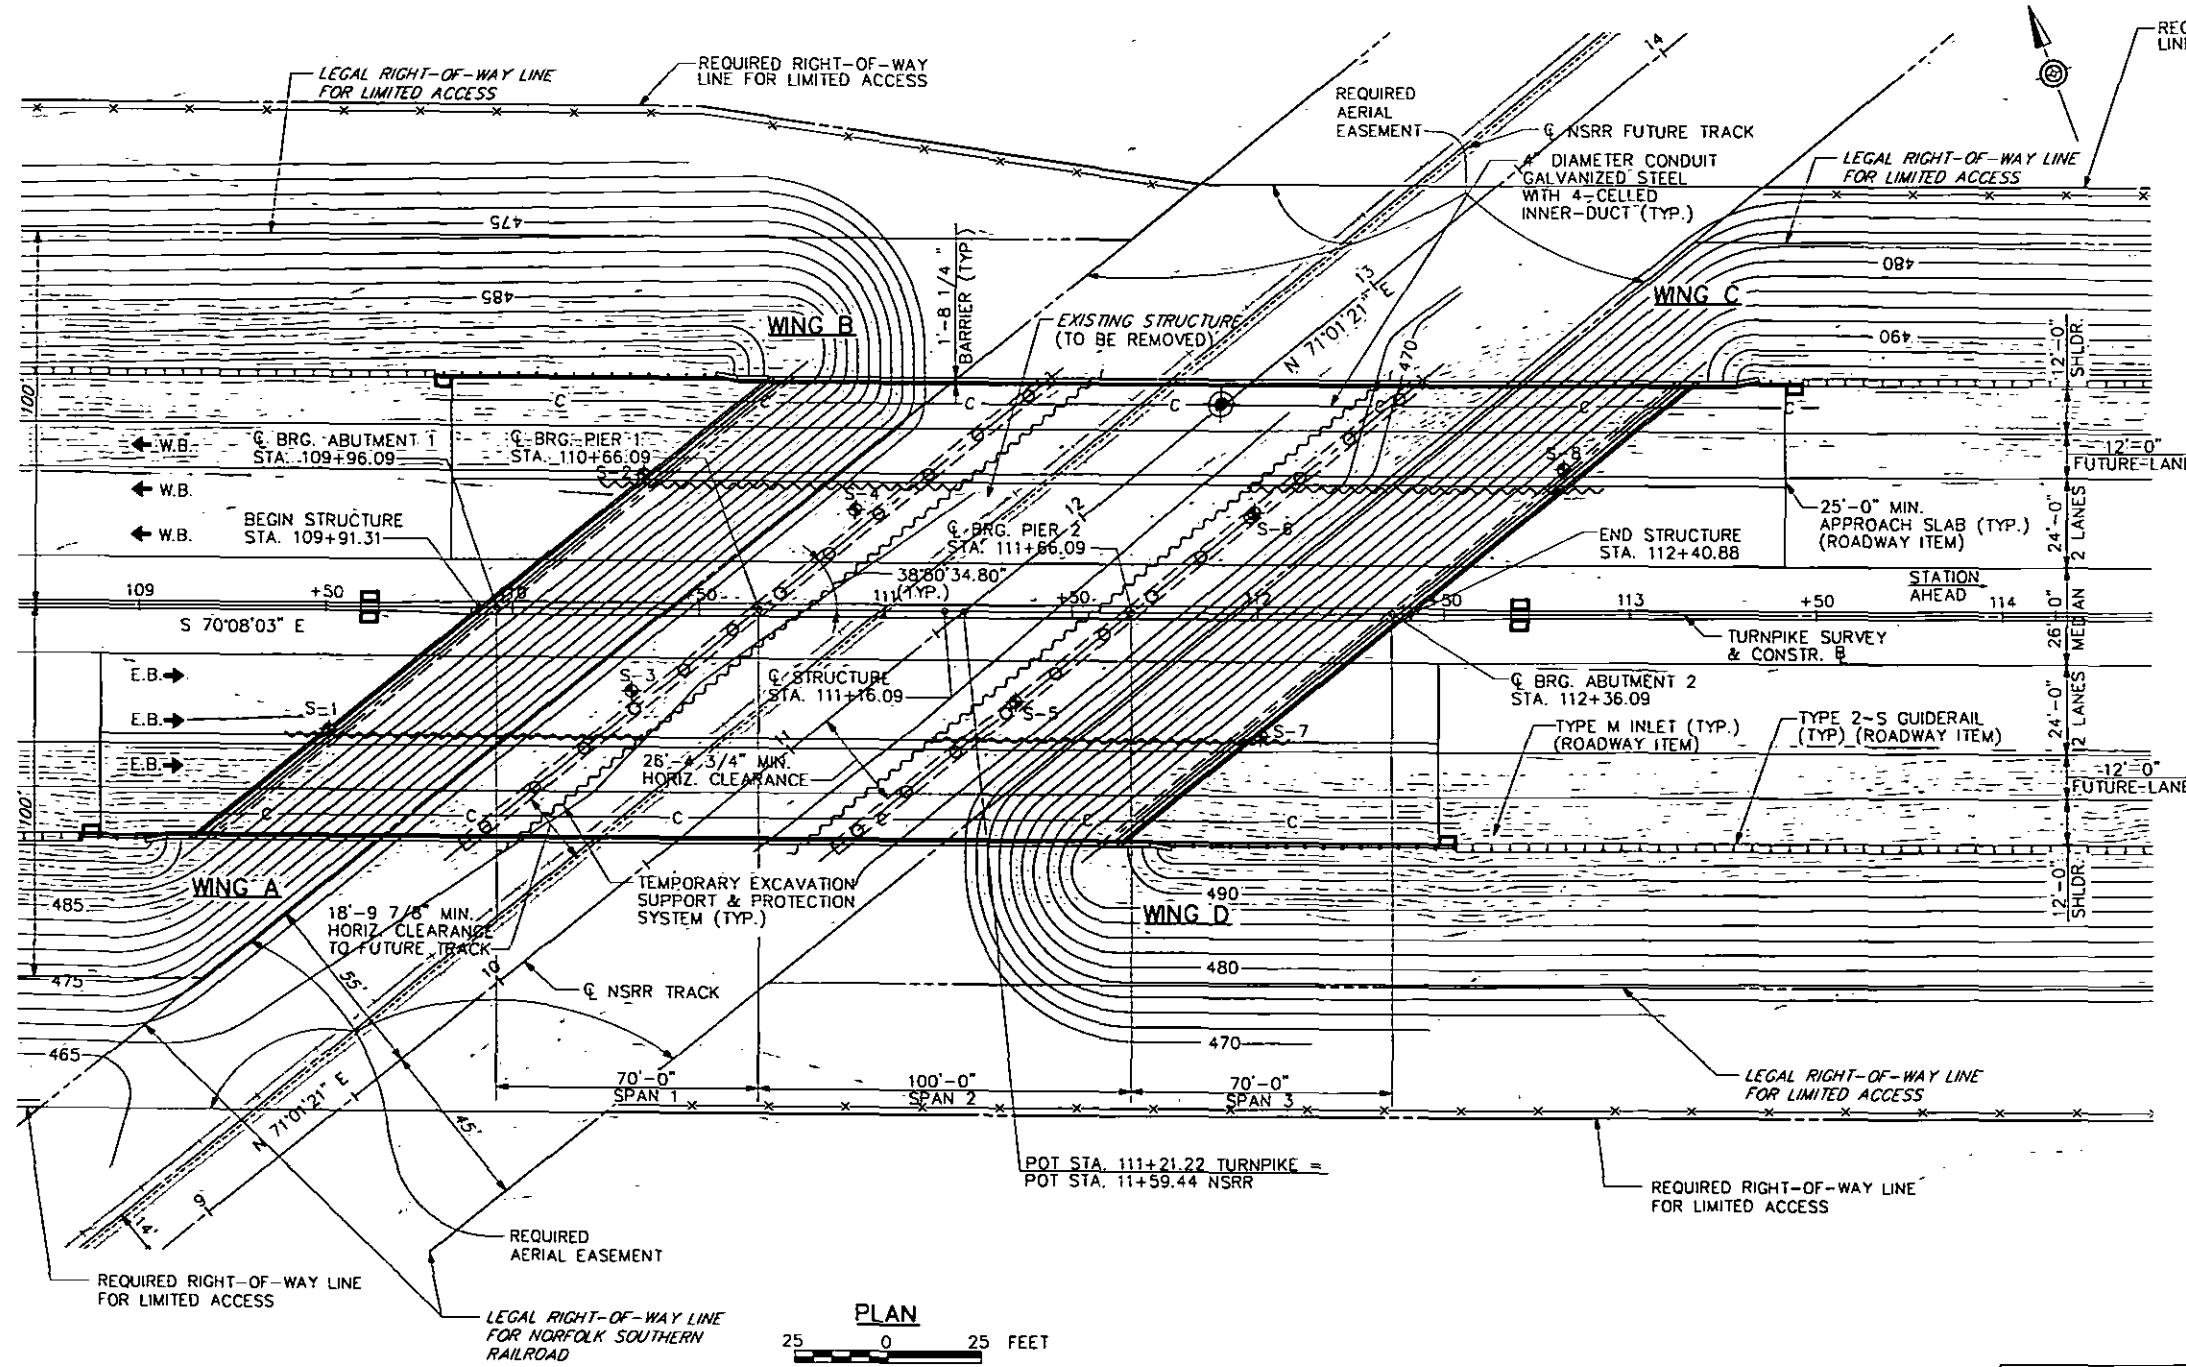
EXHIBIT C – BRIDGE TYPE, SIZE AND LOCATION PLANS
